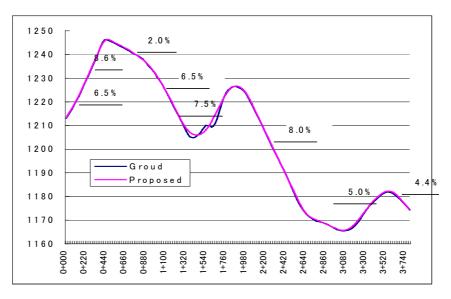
Longitudinal Cross Section of Natete Road (% shows gradients)
